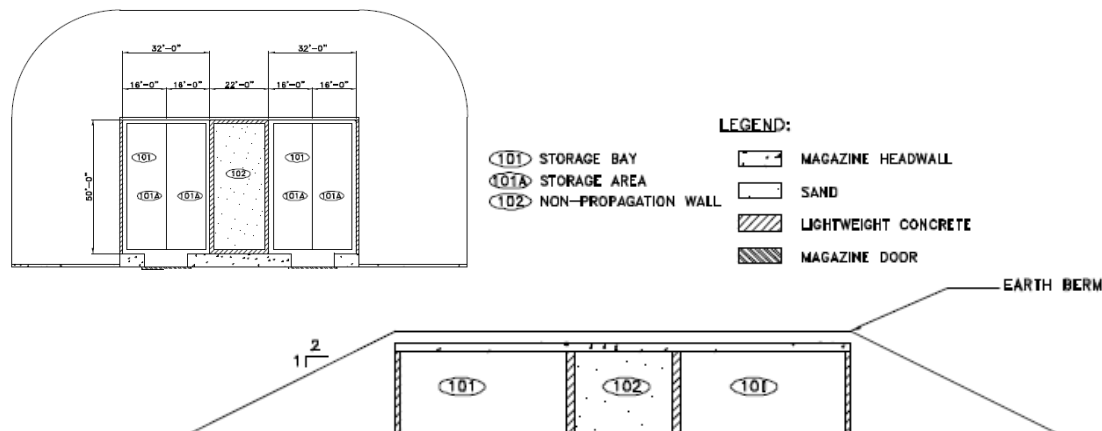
HP-2B PLAN VIEW/CROSS-SECTION
